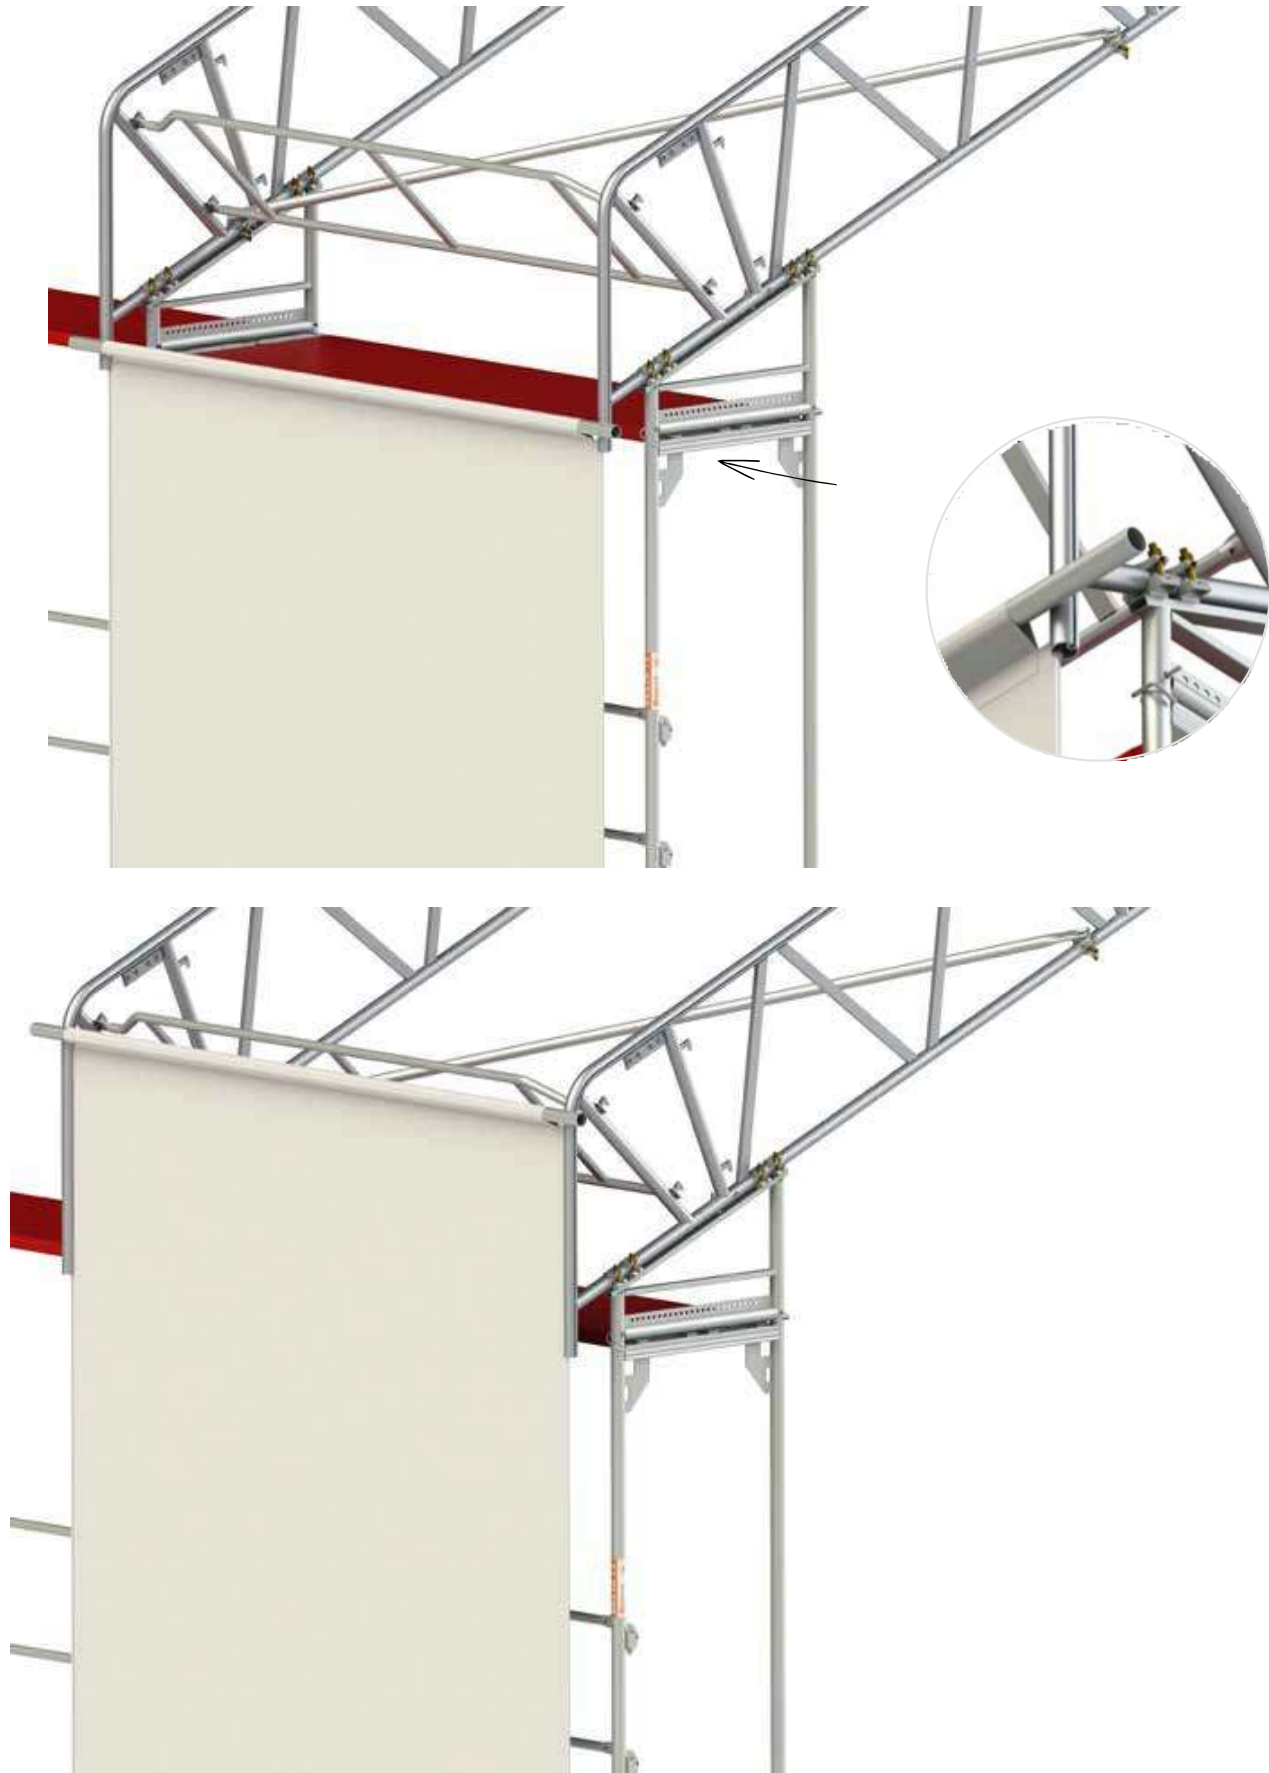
Installation of tarpaulins in special DELTA ROOF system roof profiles.
